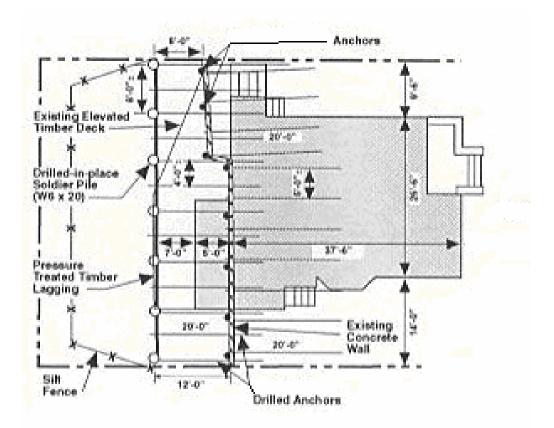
Plan view of the house, the two retaining structures, and the anchors.
